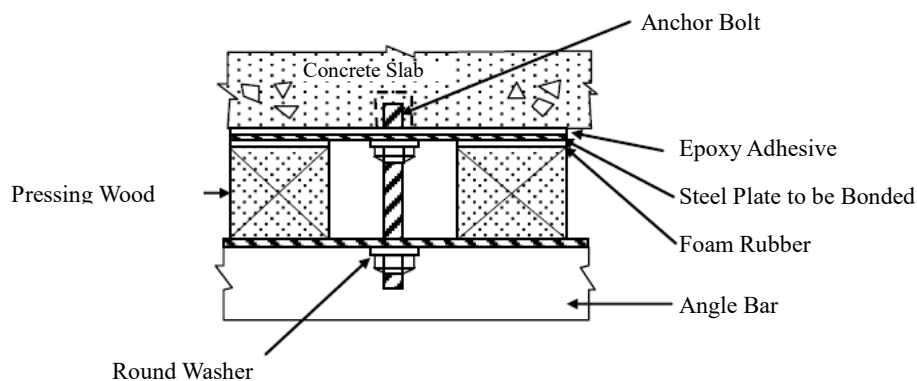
Detail of Pressure Attachment Method by Anchor Bolts
